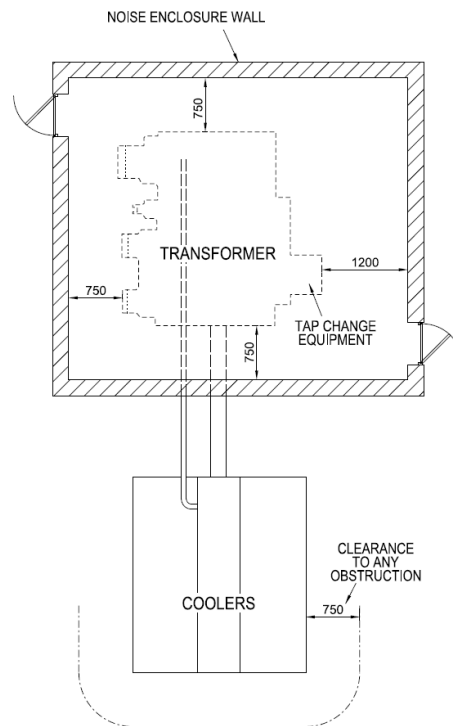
Transformer with Acoustic Enclosure Typical Setting Out
